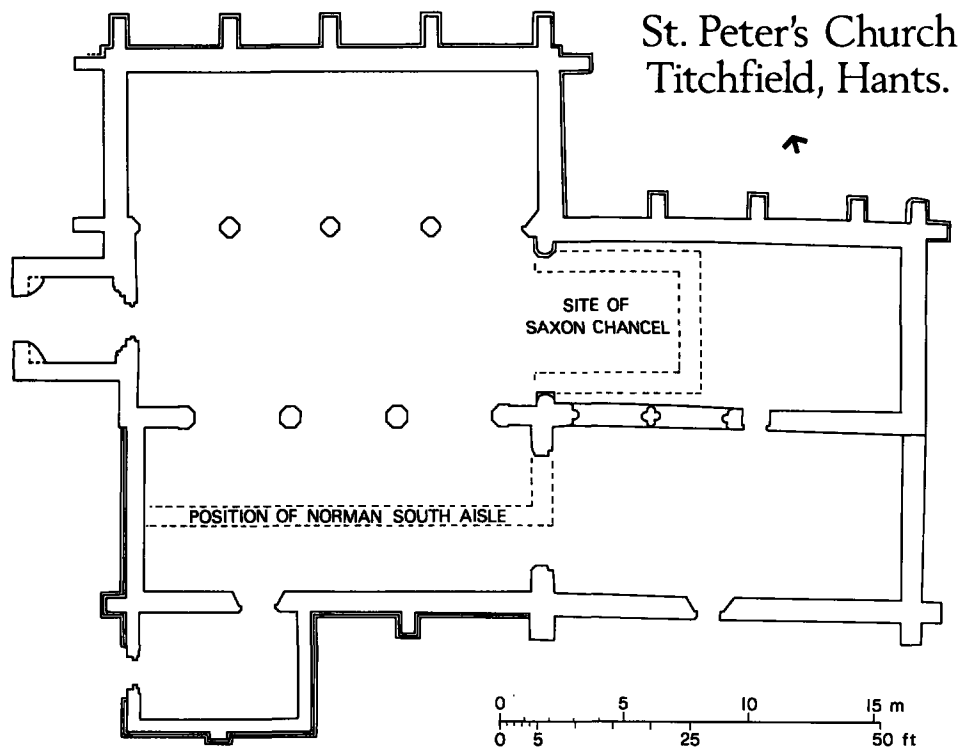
Plan of Titchfield church, 1983. The alterations made to the west end of the south aisle in 1989 are not shown.
